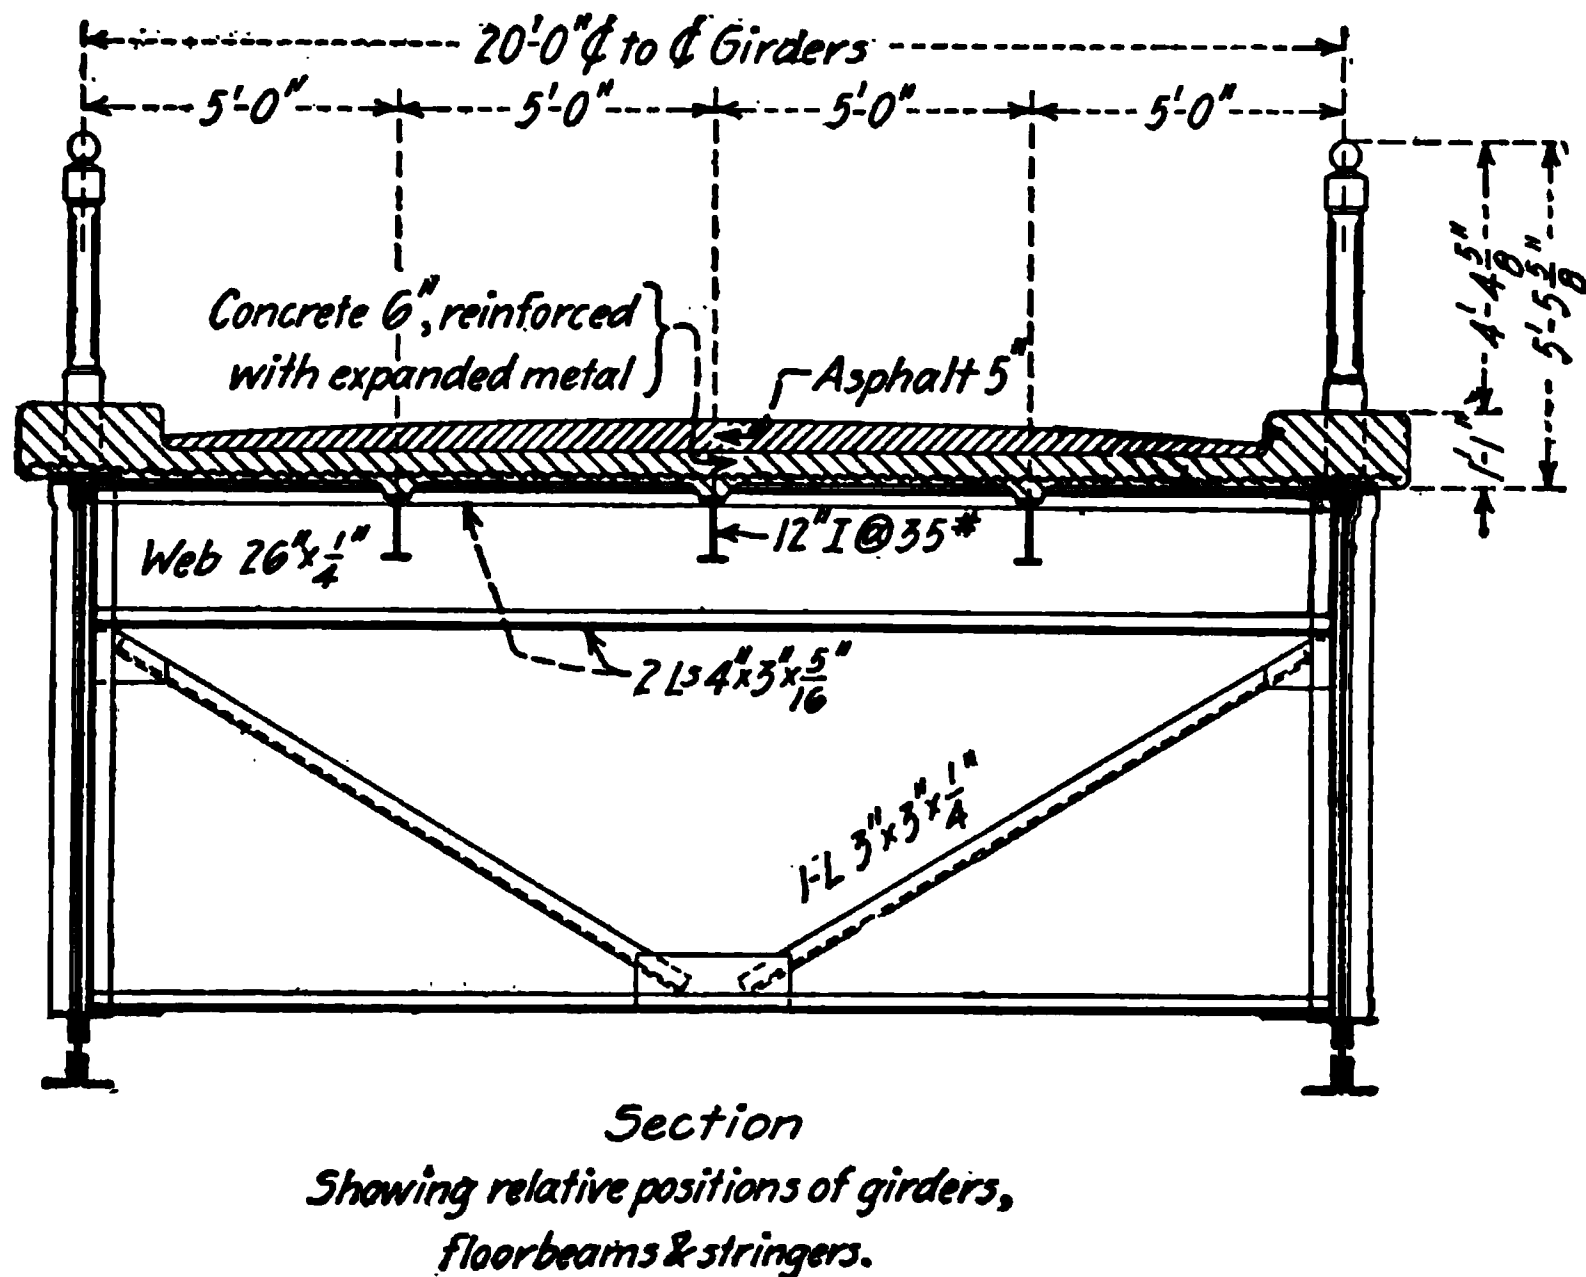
FLOOR OF HARRISON STREET PLATE GIRDER BRIDGE, PRINCETON, N. J.
